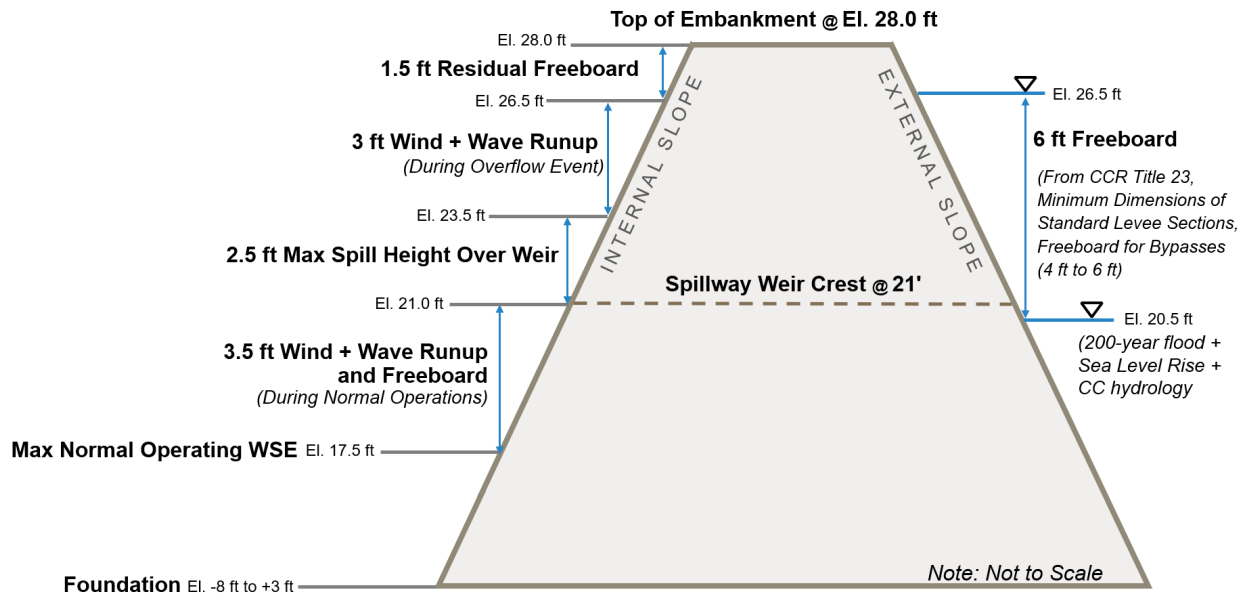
Southern Forebay Water Surface Elevation and Crest Elevation Schematic
